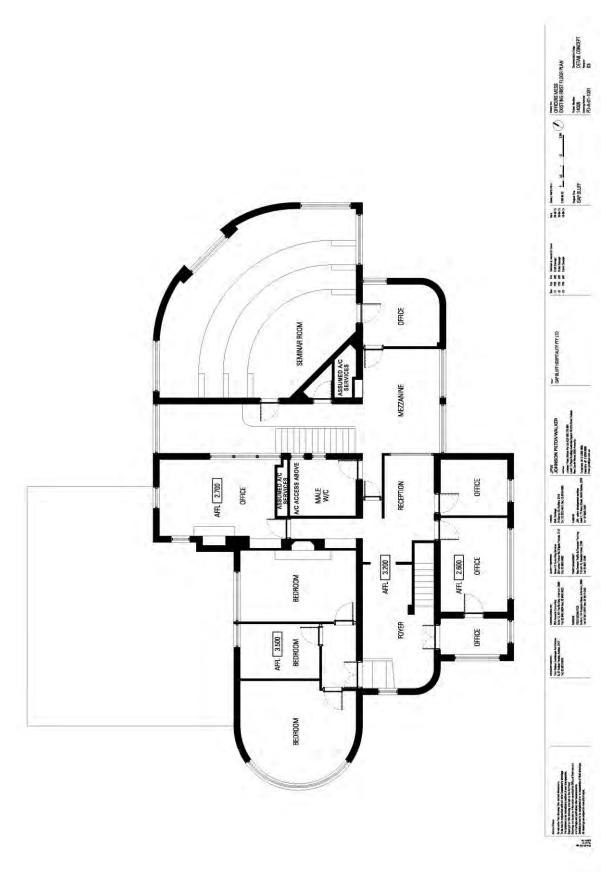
Existing first-floor plan, Officers Mess. (Source: JPW 2015)
